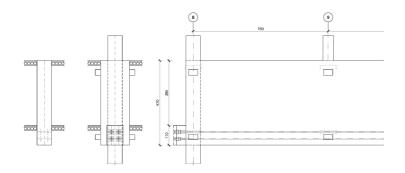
Geometrical definition and details of the post tensioned in-situ concrete beams for auditorium area in west zone.
